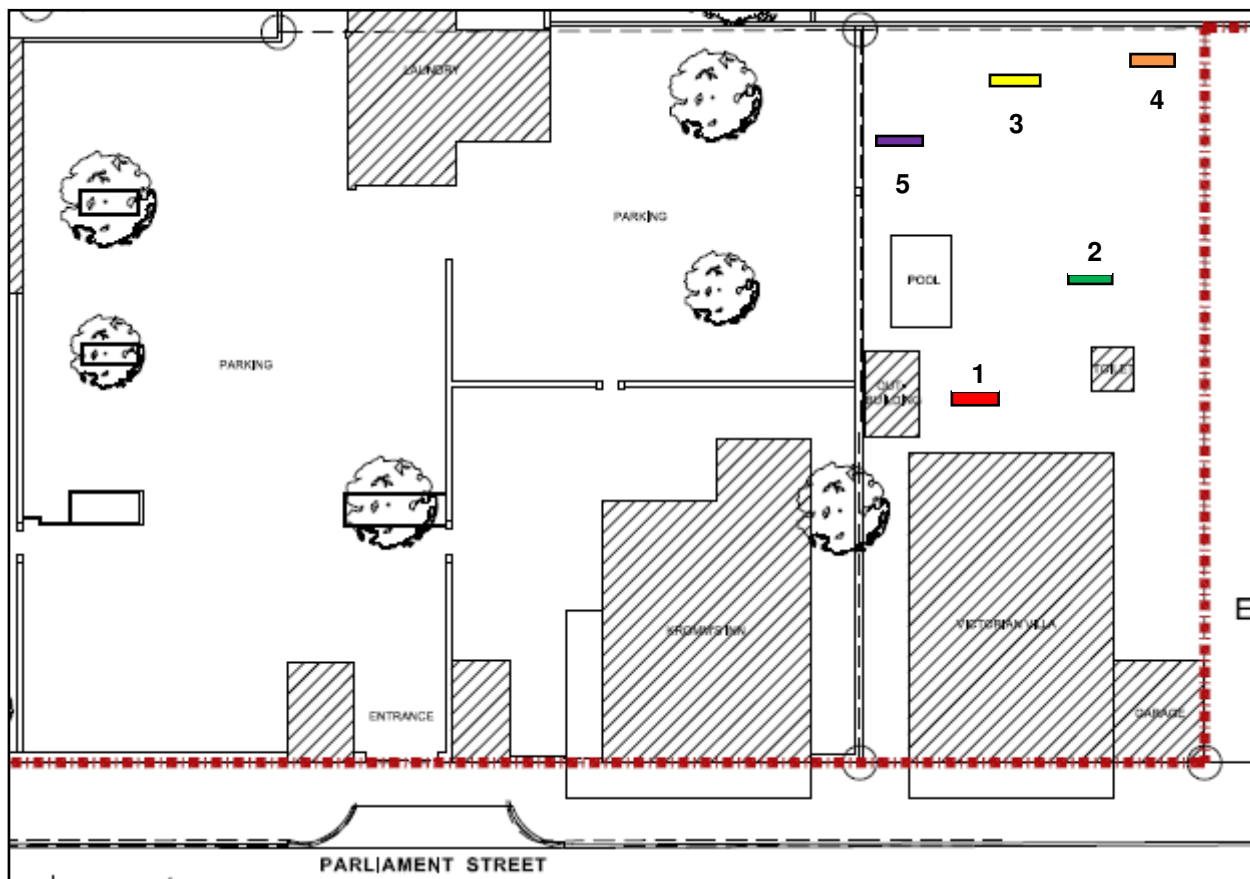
Location of test excavations in the garden behind No 5 Parliament Street.
